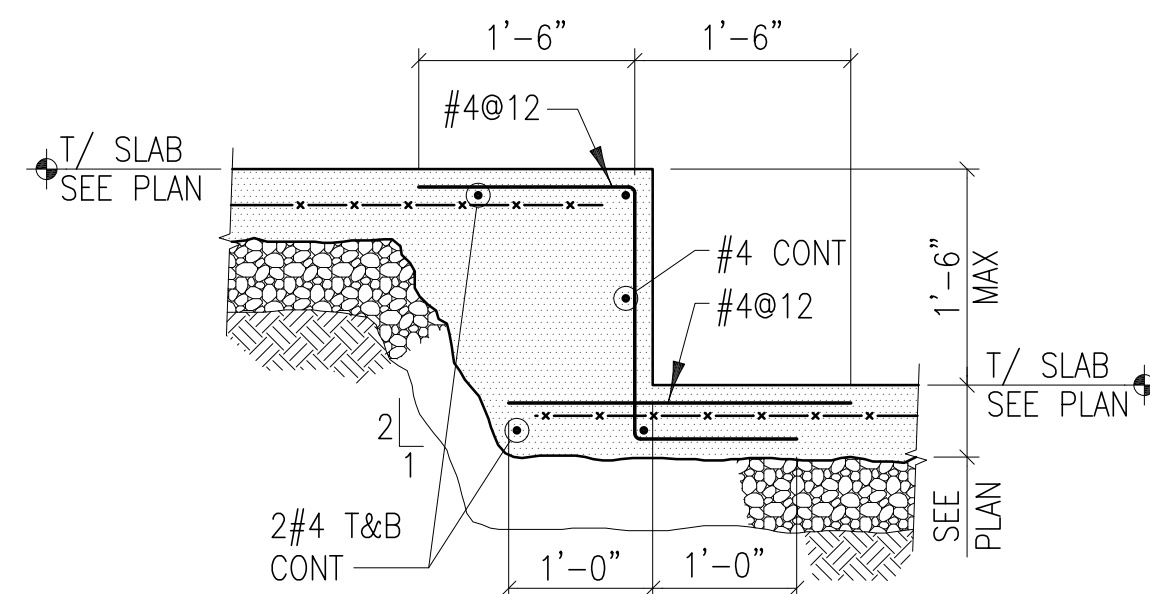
DETAIL - TYPICAL SLAB ON GRADE DETAIL
